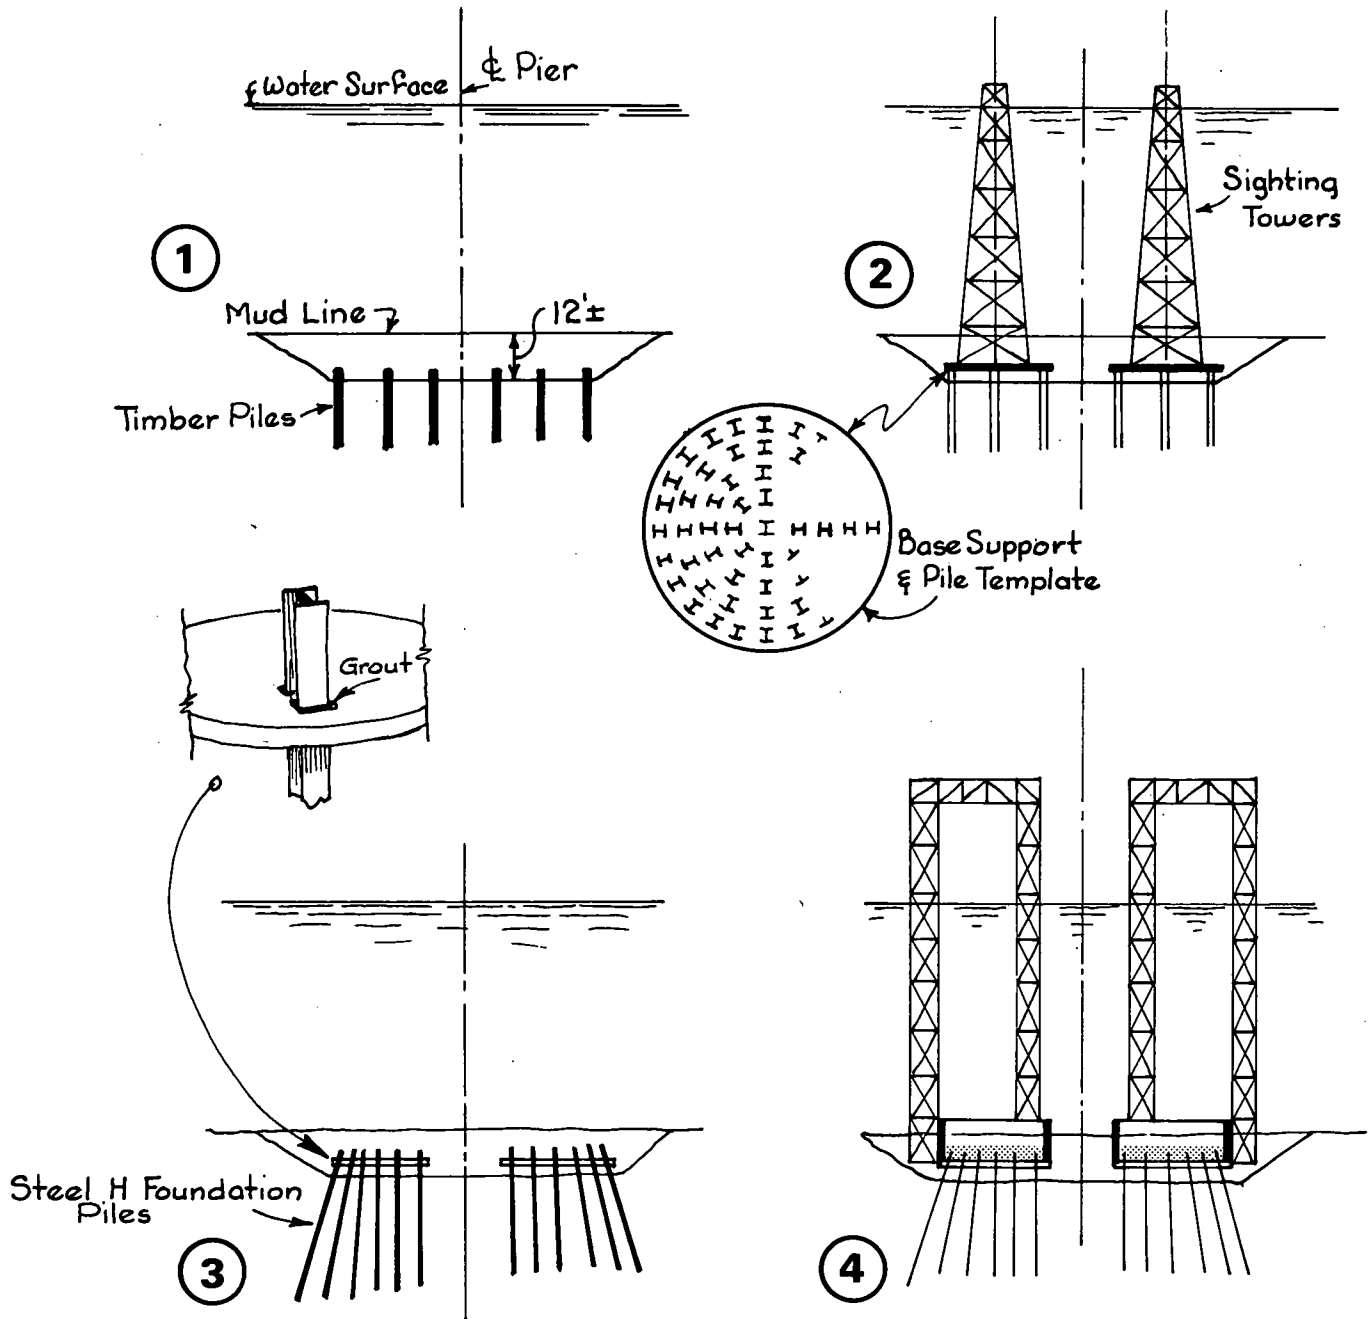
San Rafael Bridge. Pier Construction sequence 5-7.
